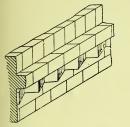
and 417. -- Top of Water Tower in Moulded Bricks.
